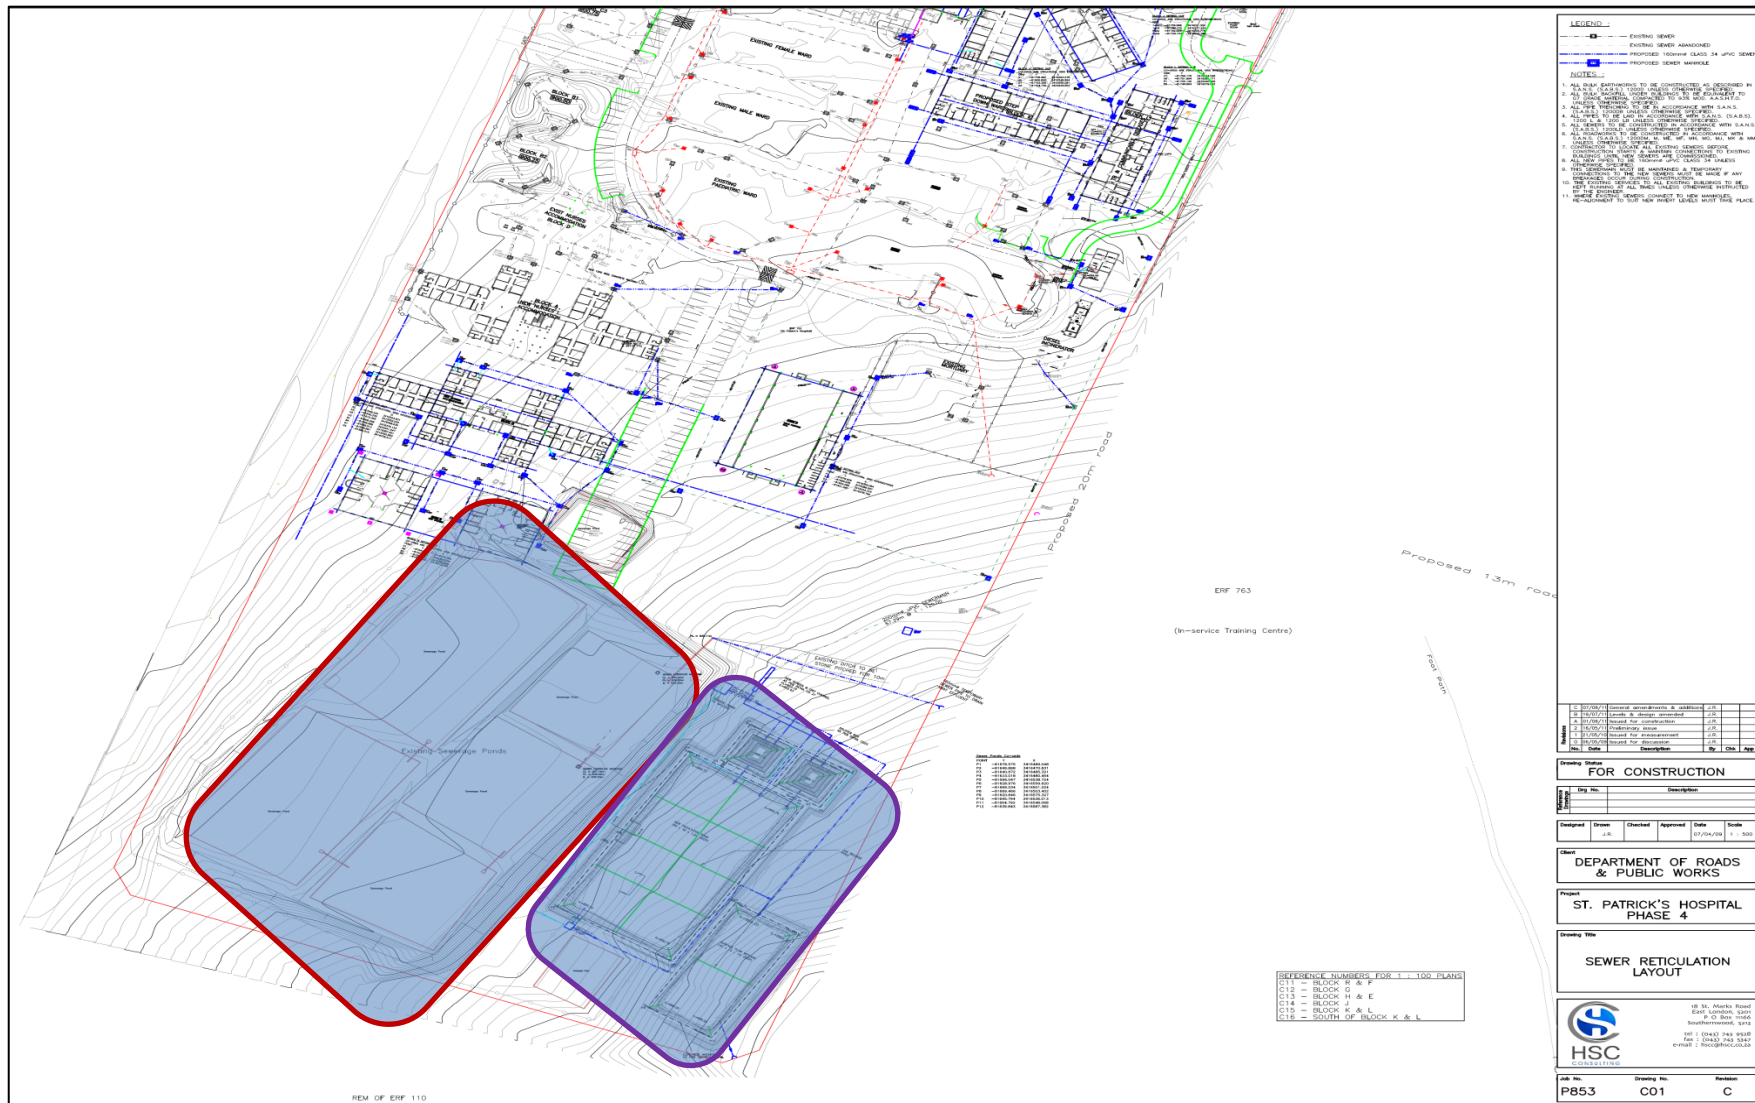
Design layout of the existing (red square) and proposed oxidation ponds (purple square).
